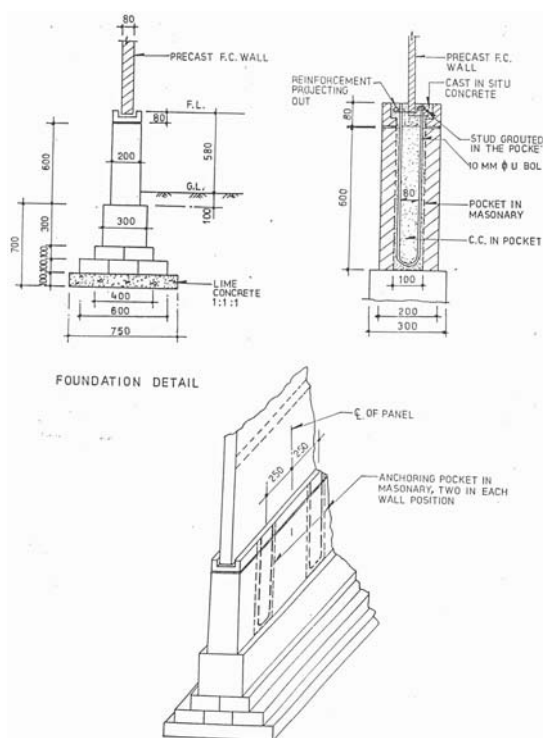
VERTICAL SECTION OF WALL ASSAMBED
